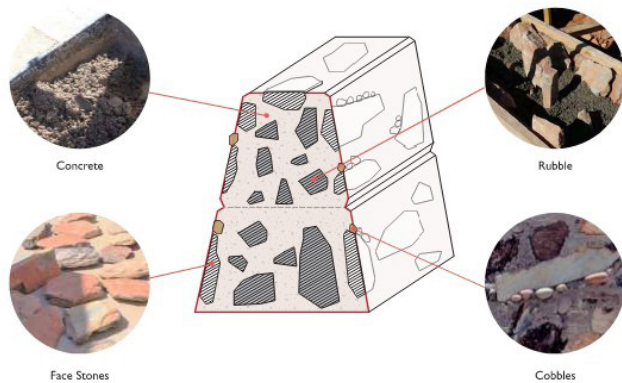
Cross sectional view of a desert masonry wall, showing four different material compositions. (Source: images from franklloydwright.org, "New Desert Masonry Gateway Structure Unveiled at Taliesin West")
